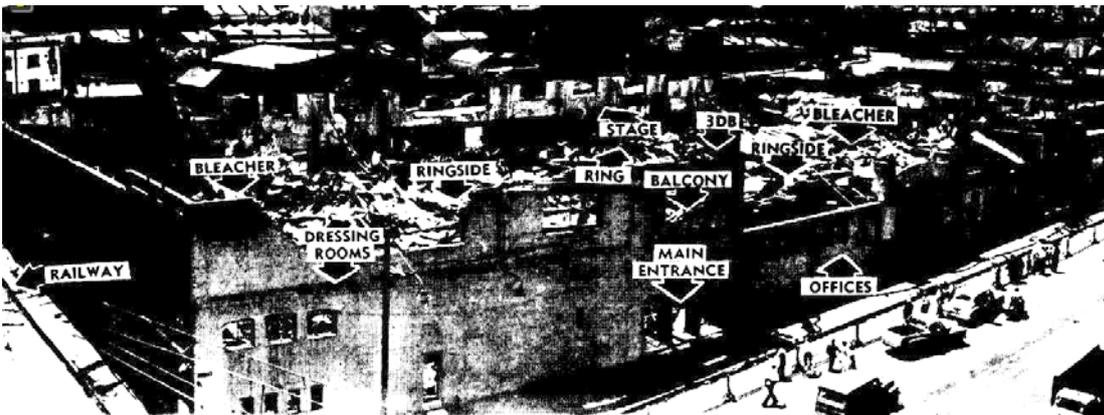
Plan of layout of 1910s West Melbourne Stadium, 1942
